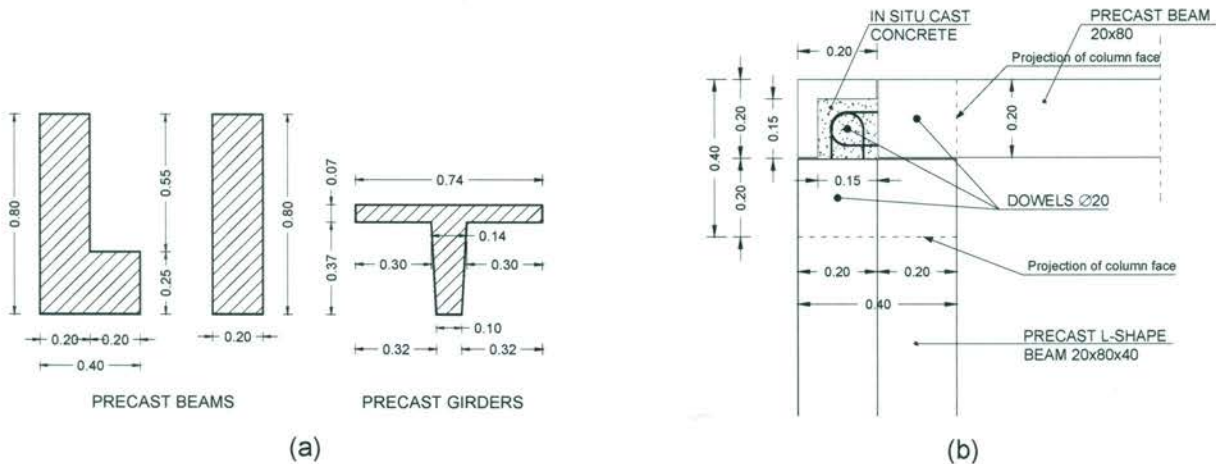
Specimens 1, 2 and 3: (a) cross sections of the precast beams and girders; (b) detail of the column-to-beam connection (plan view).
